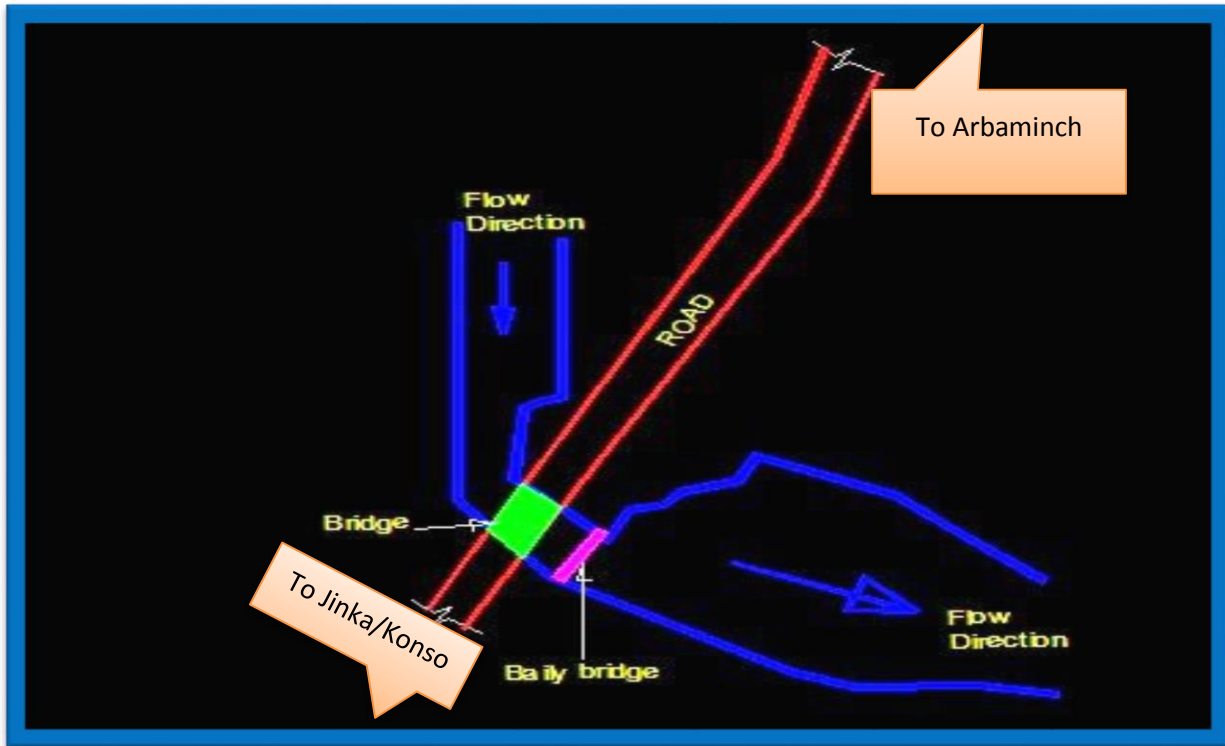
Sile River Lay Out With Respect to the Road/Bridge
